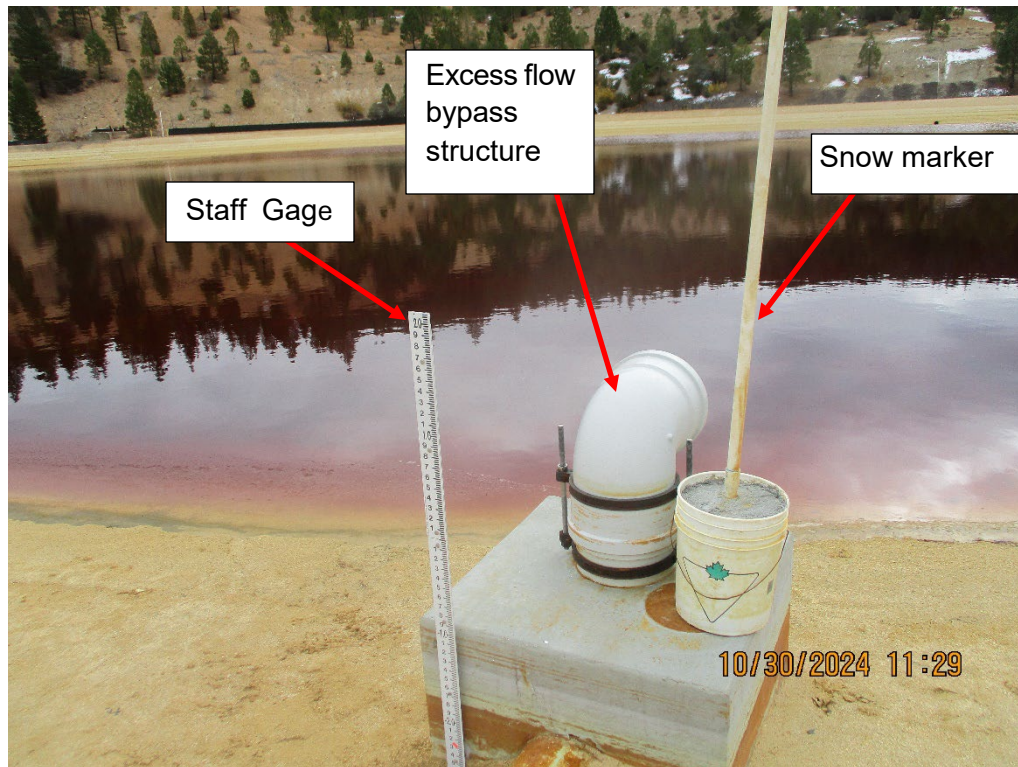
October 30, 2024, Staff gage installed at the Pond 1 excess flow bypass structure.
